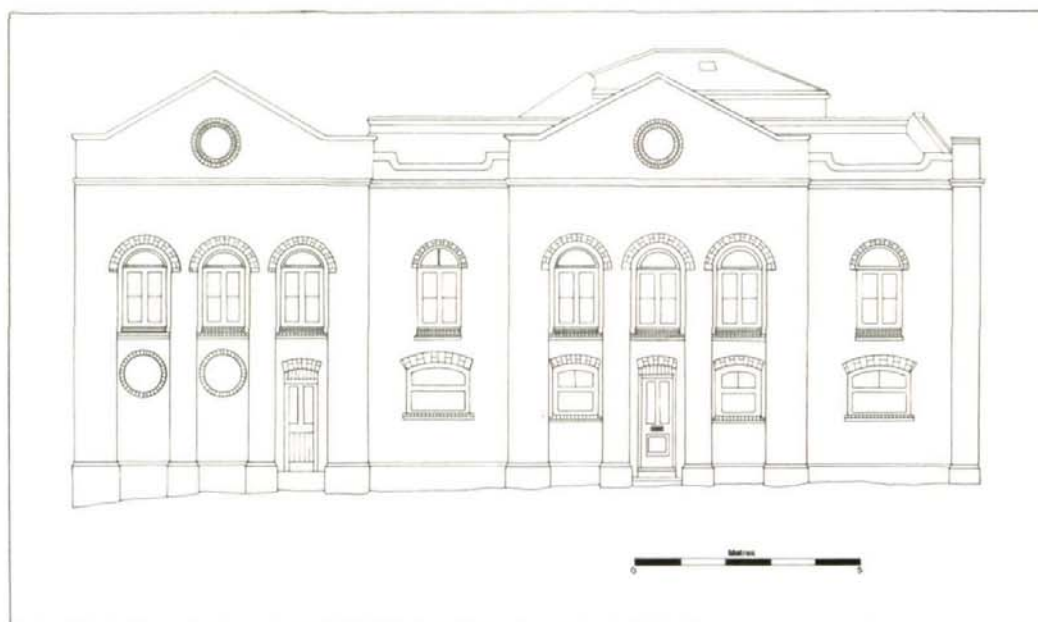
Reconstructed elevation of the west front of the Hyde Brewery.
